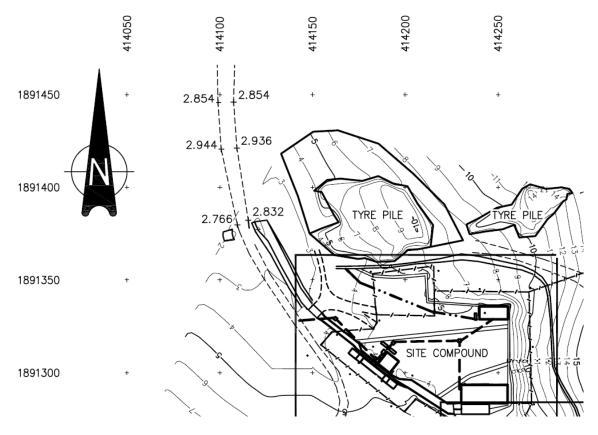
Available area layout plan prepared for the construction of Cooks Landfill in 2007
